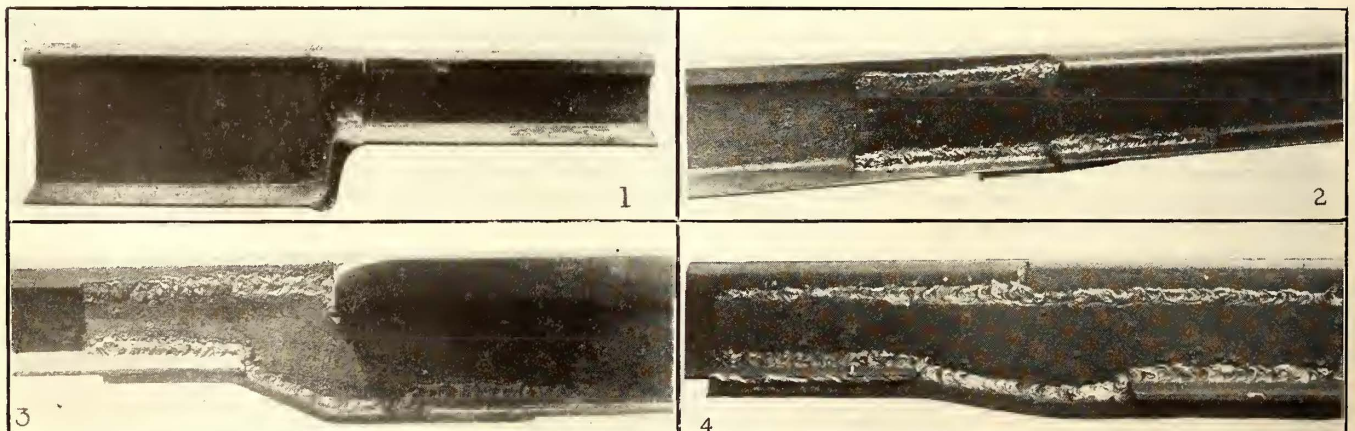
Compromise thermit joint between 9-in. flange rail and 5-in. T-rail. Fig. 2—Electric arc welded compromise joint between two rails of approximately the same size. Fig. 3—Electric arc welded compromise joint between 5-in. T-rail and 7-in. girder guard rail. Fig. 4—Electric arc welded compromise joint between 4 1/4-in. T-rail and 5-in. T-rail.
